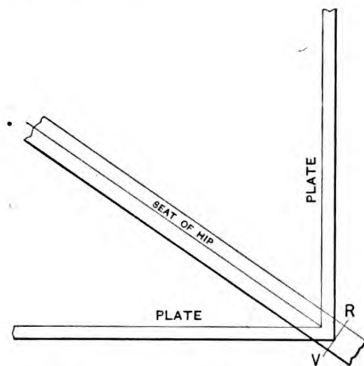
Plan of Corner Building, Showing Seat of Hip Rafter.
